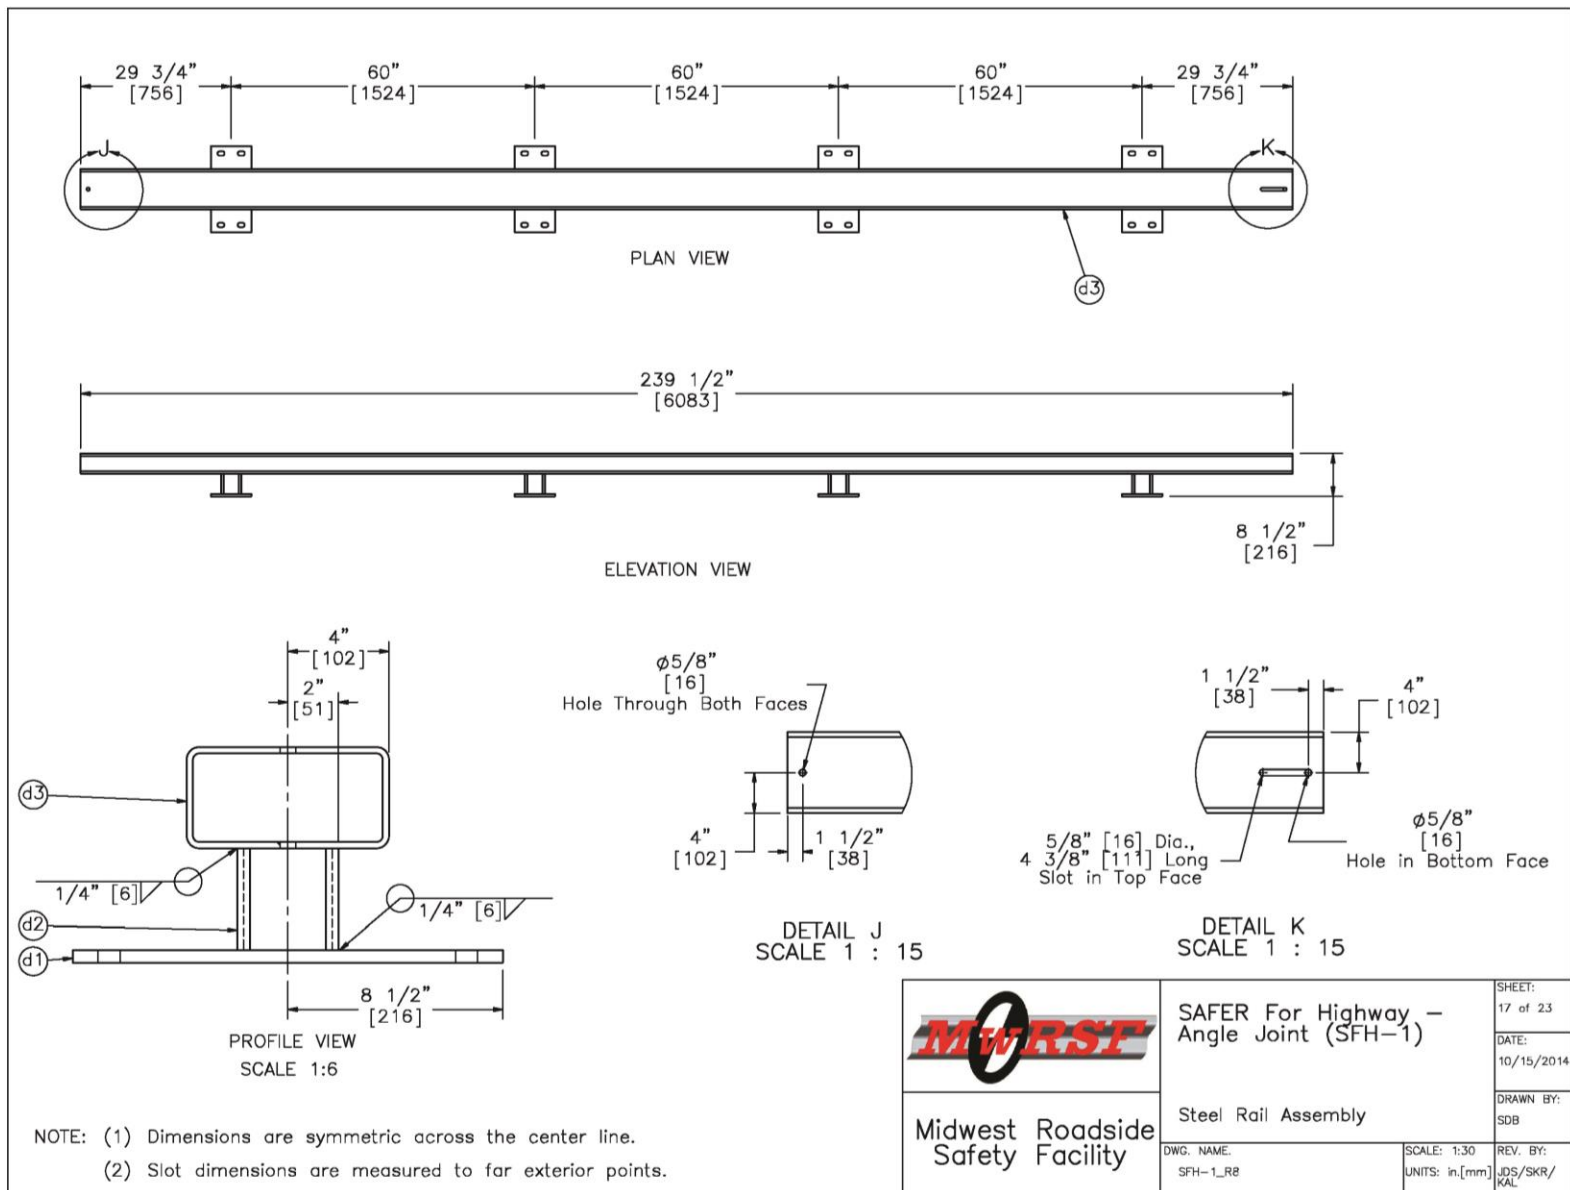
Recommended Barrier Design for Full-Scale Crash Testing, Steel Rail Assembly
